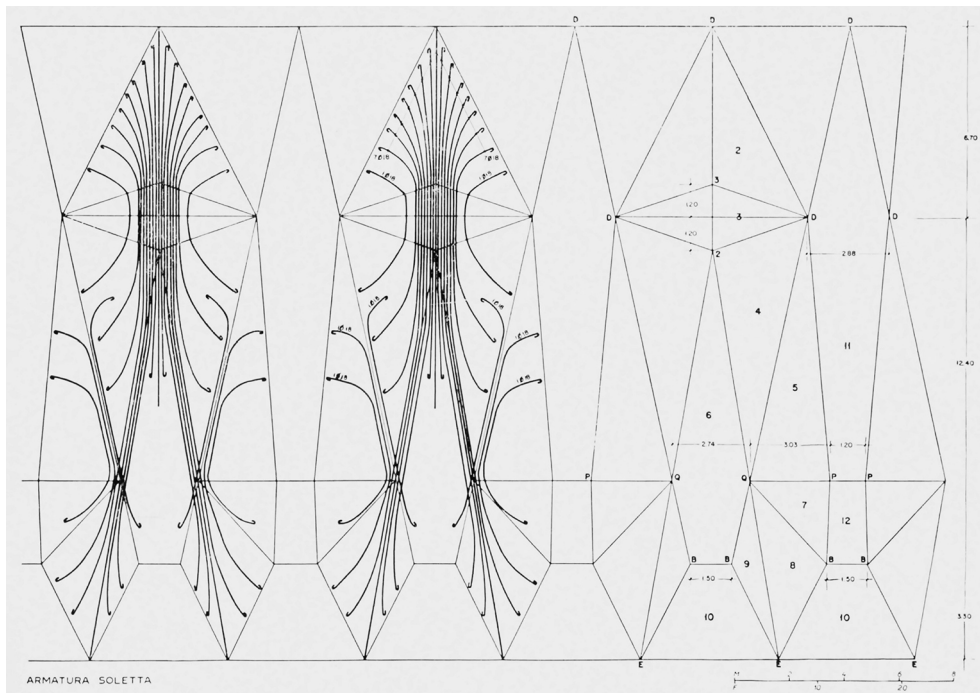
Musmeci: Stabilimento Raffa in Pietrasanta (1956). Final plan of the roof with the main reinforcement layout (Musmeci 1960, p. 711)
